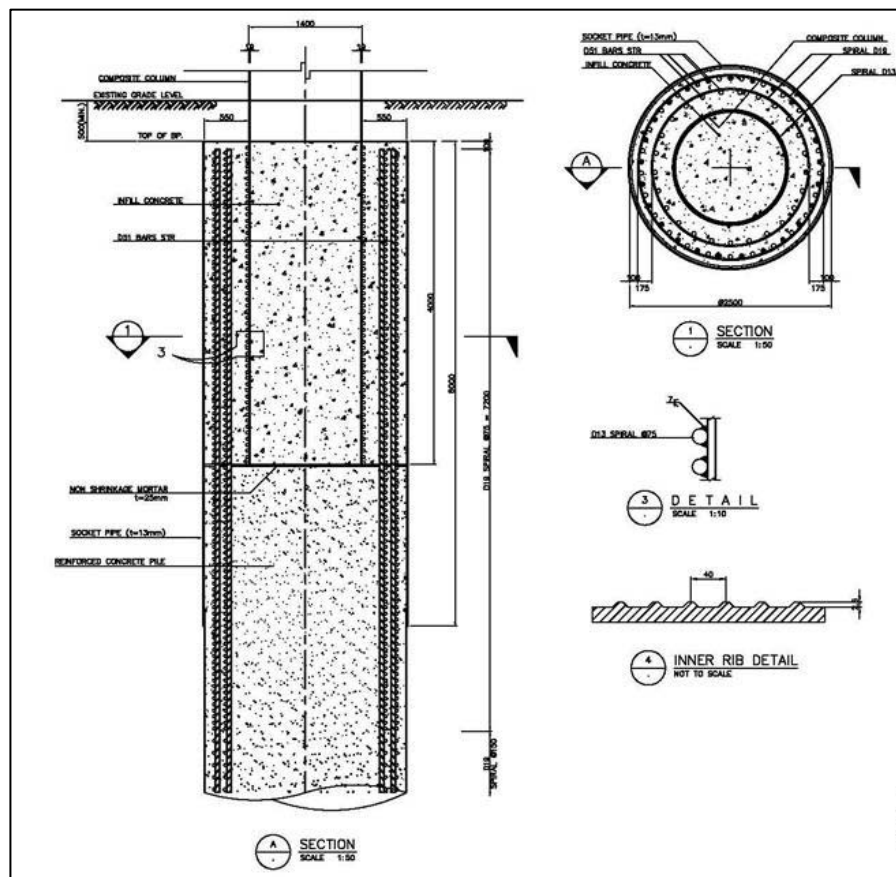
COMPOSITE COLUMN SOCKET TYPE CONNECTION
